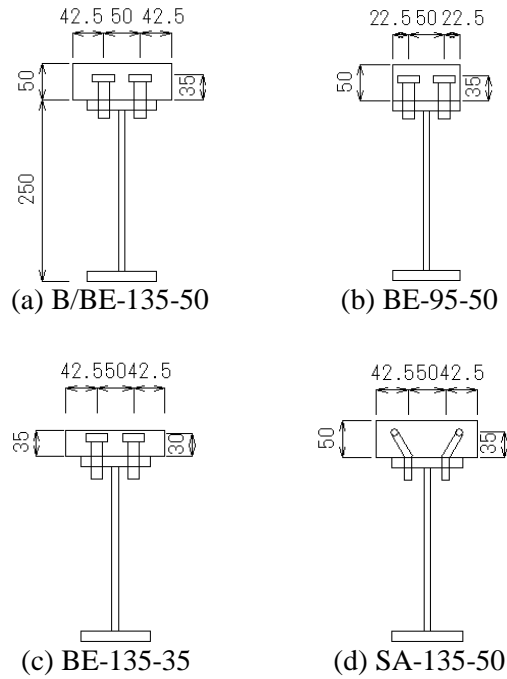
Dimensions of the beam cross-sections (unit: mm)
